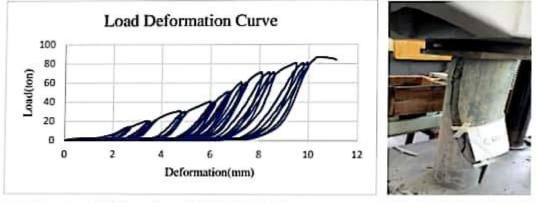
(a) Load and Deformation of CRC(PVC) Column
